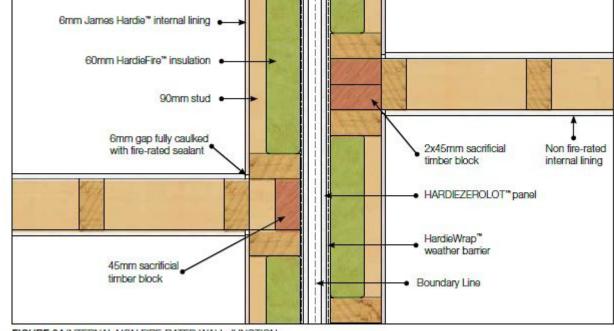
INTERNAL NON FIRE-RATED WALL JUNCTION
